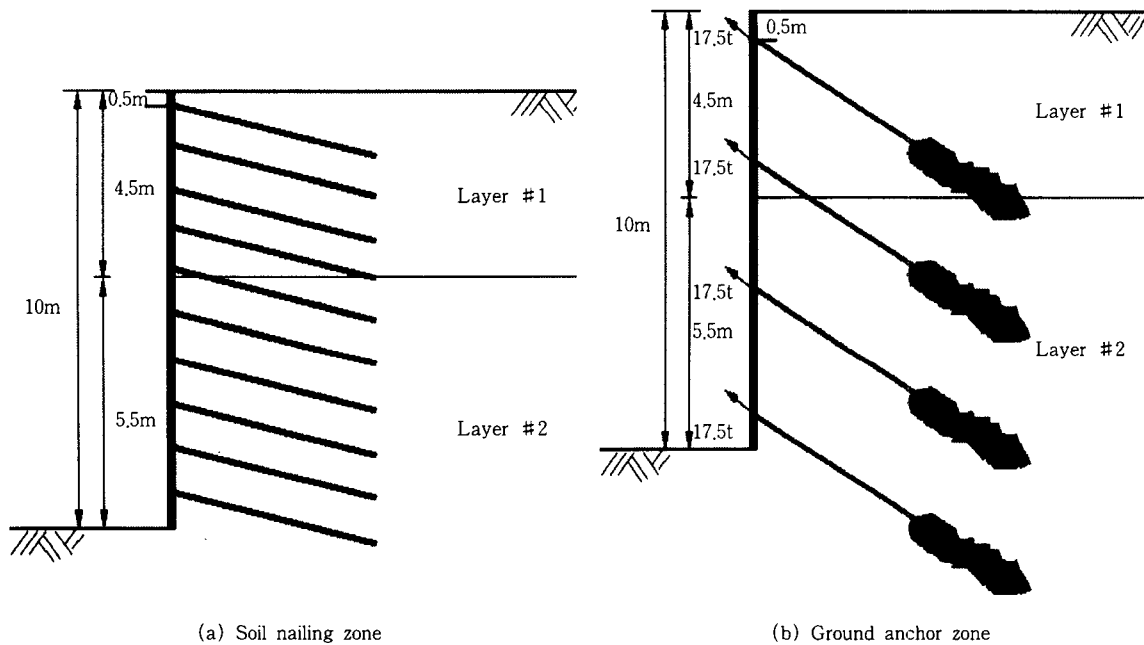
A schematic sectional representation of the vertically mixed nail-anchor system
